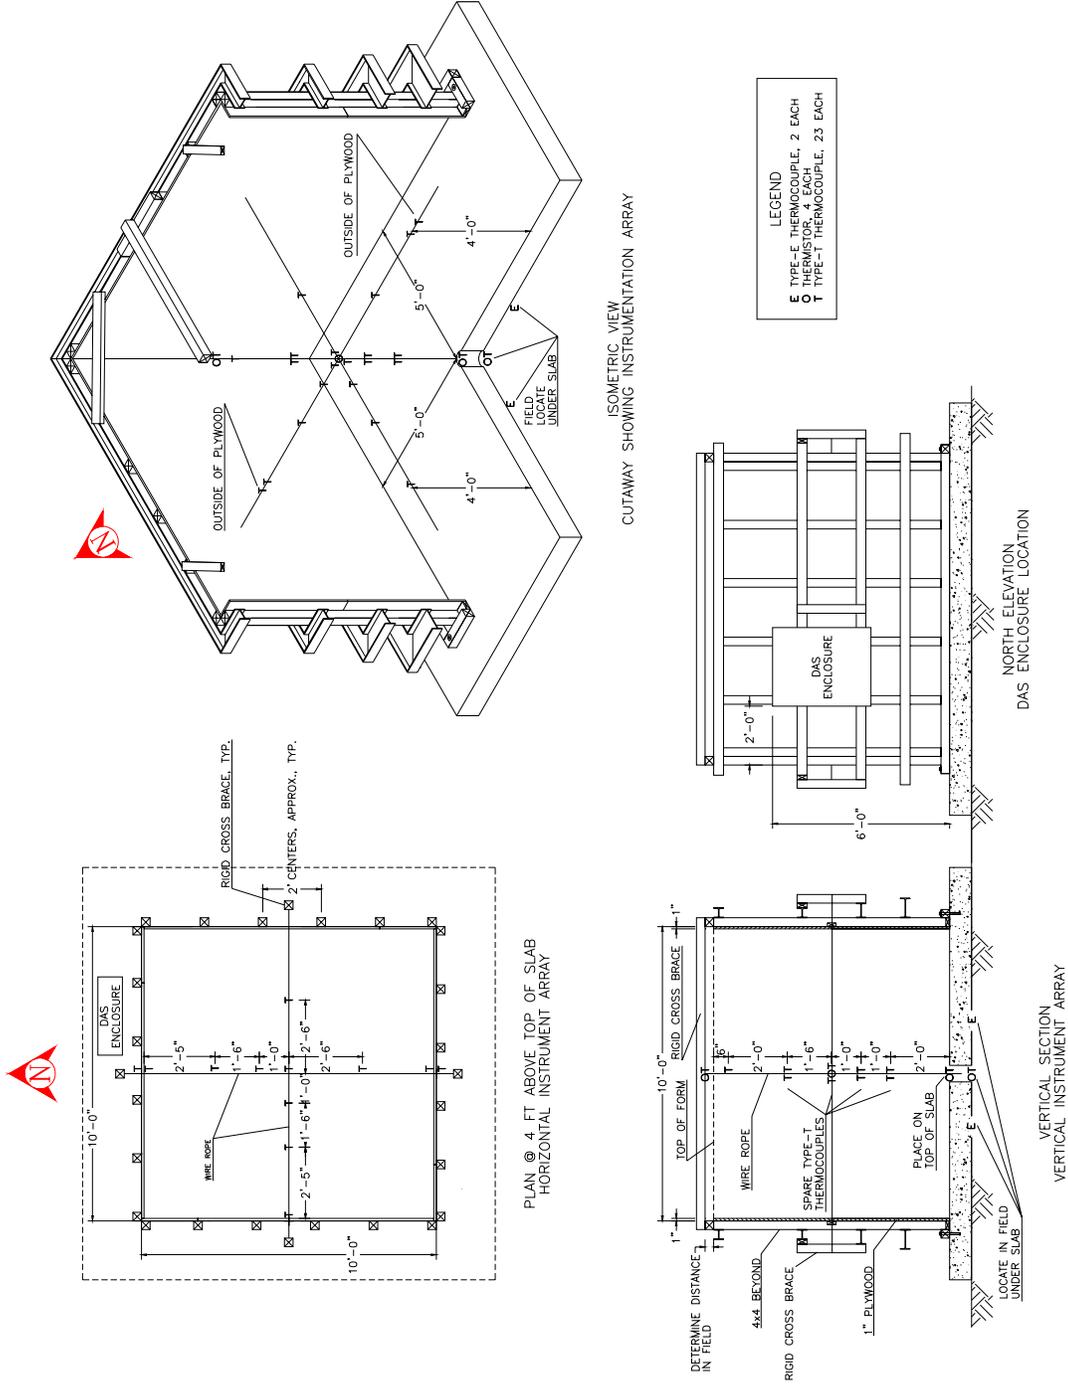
Sketch of Thermistors, Thermocouples and Thermocouple Support Wires Layout.
